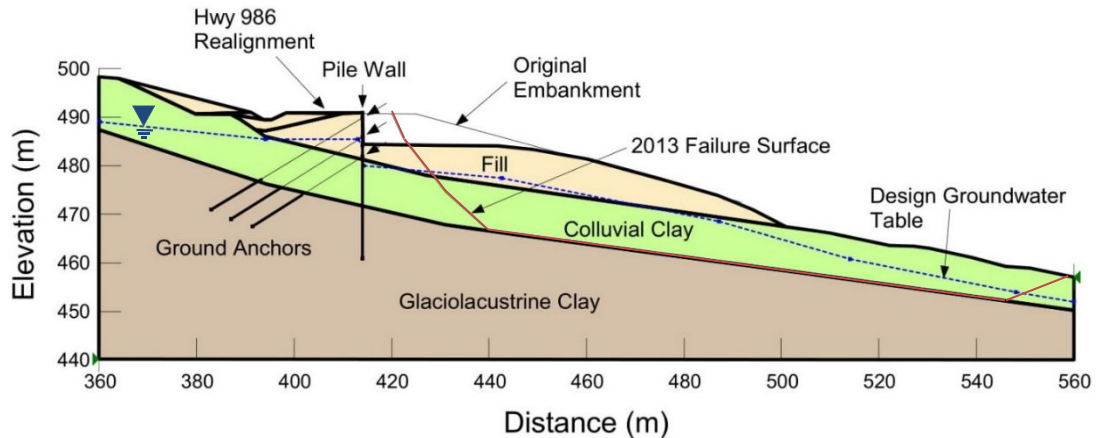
Design section showing the pile wall, ground anchors, and realigned Highway 986:01
